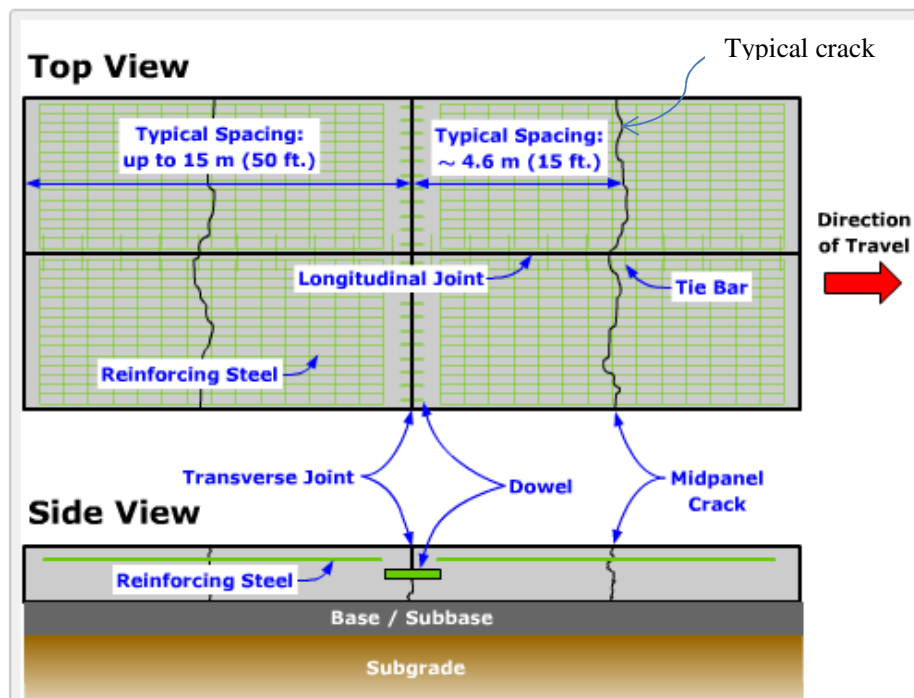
Typical cross-section of a concrete pavement showing key features.
